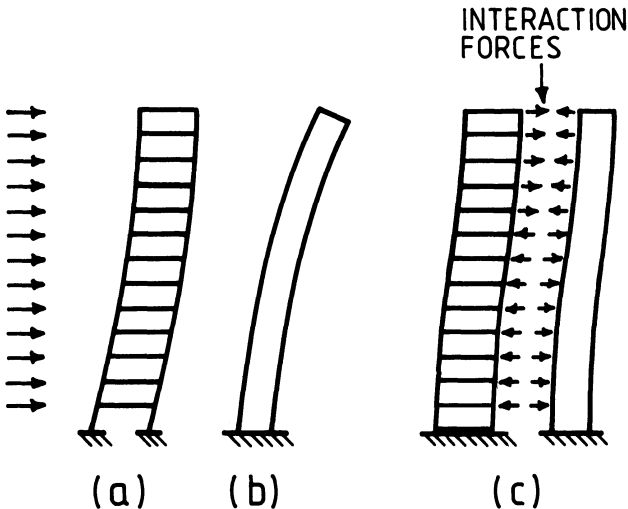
Interaction between frame (deforming in shear mode) and wall (deforming in flexural mode) constrained to act together by floor slabs
